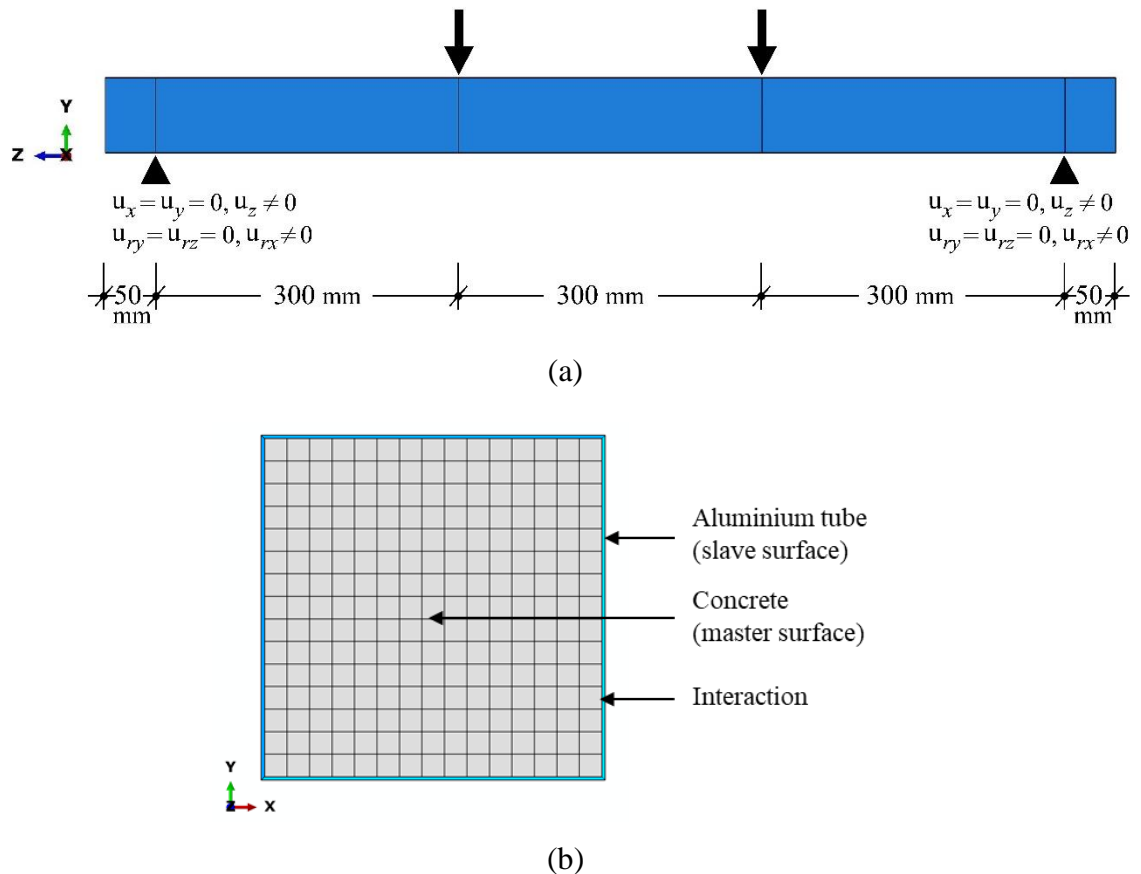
FE model of a typical CFAT beam: (a) geometry, loading and boundary conditions, (b) cross-section
